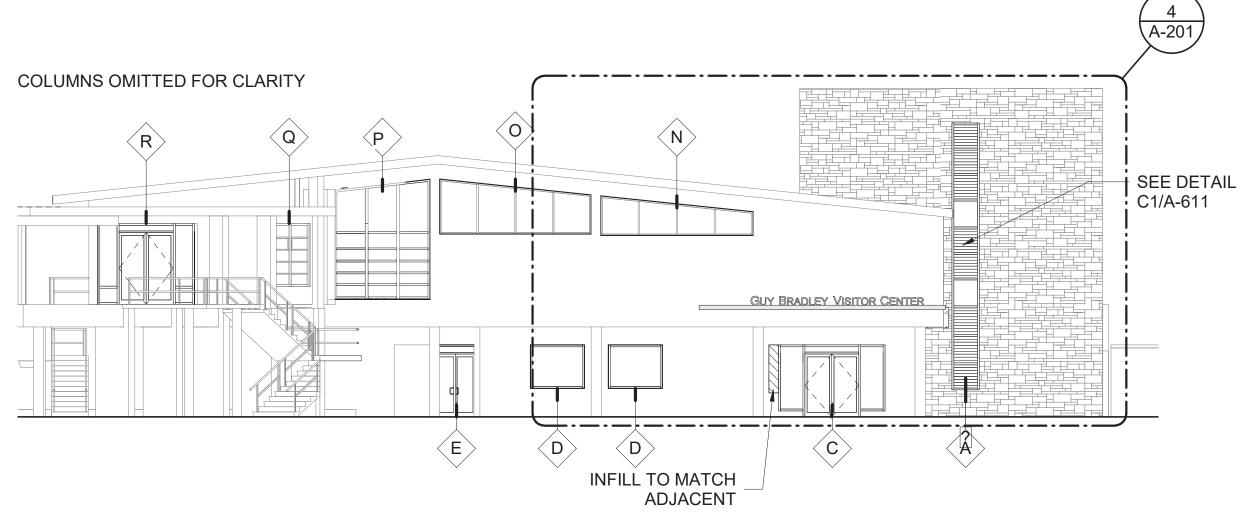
NORTH ELEVATION OF VISITOR CENTER (1961)
